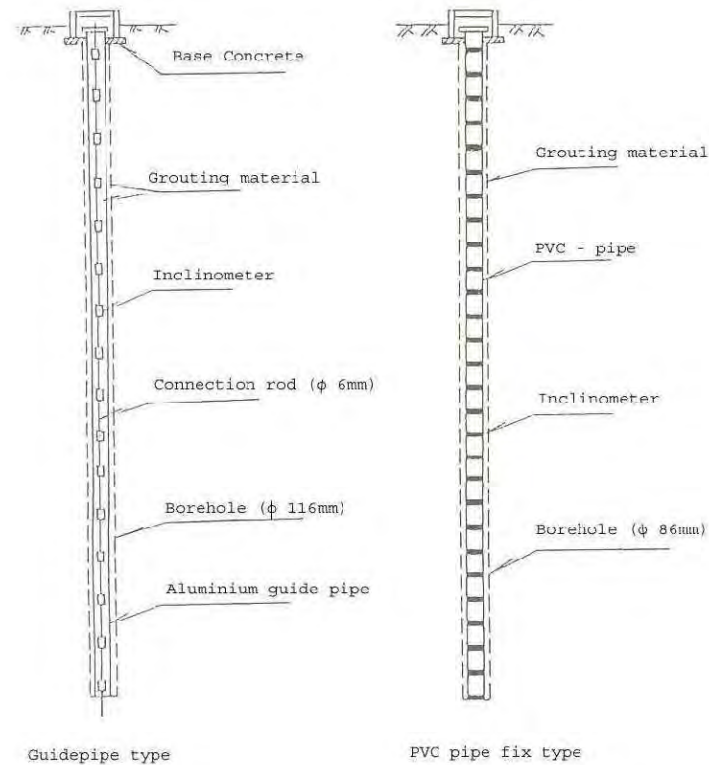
Typical Installation of the In-Place Inclinometer
